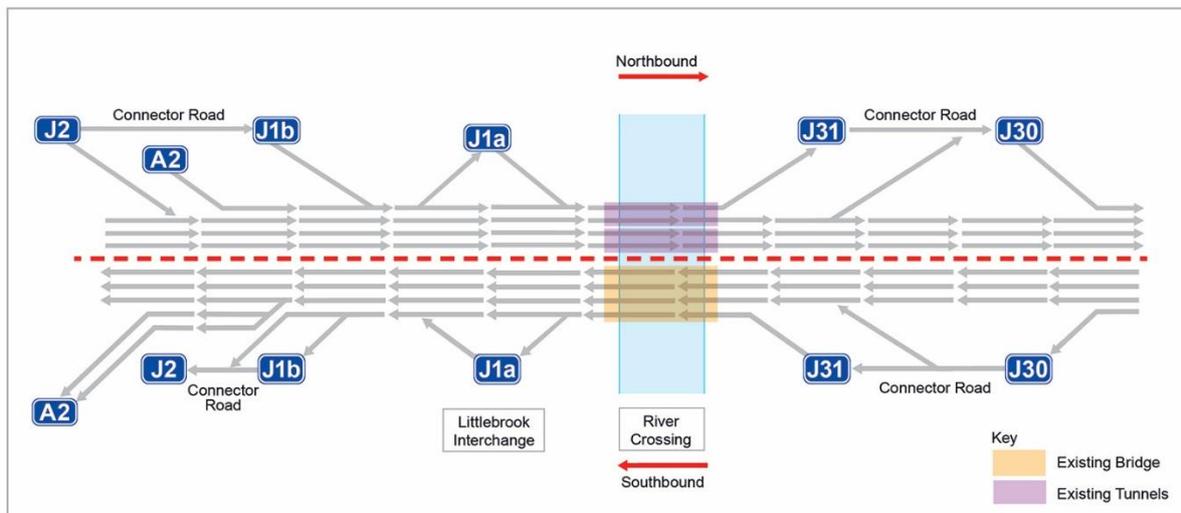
EXISTING ROAD LAYOUT ALONG M25/ A282 CORRIDOR
